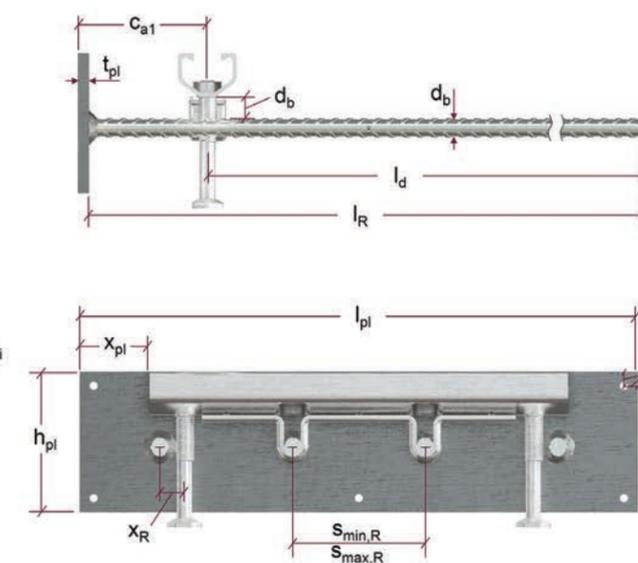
HAC-T EDGE C dimensions, section and elevation view.
